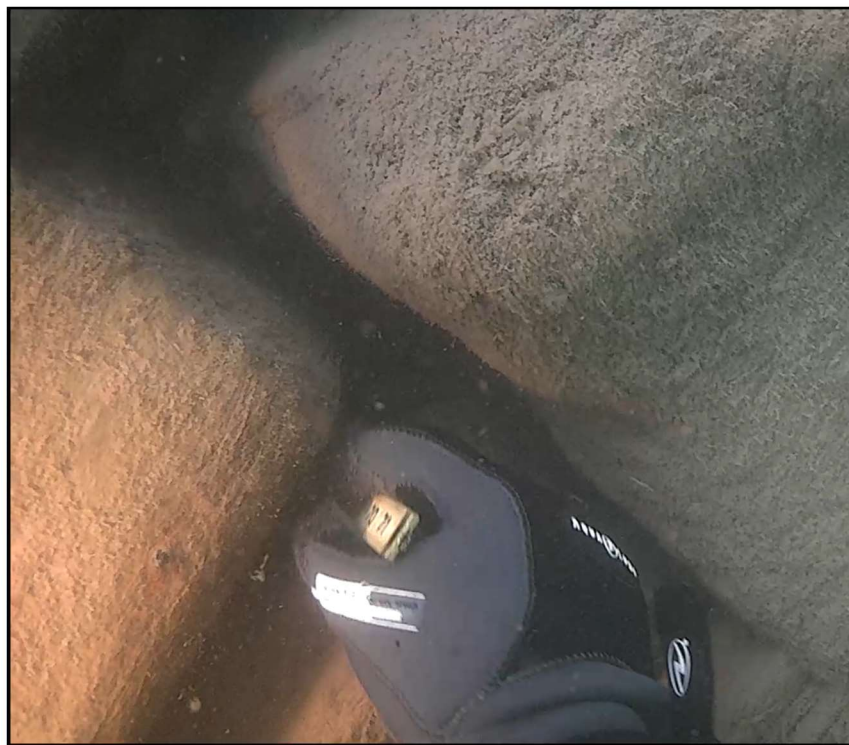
Diver probing at first mortise & tenon joint from top. Probe depth greater than 70 inches.
